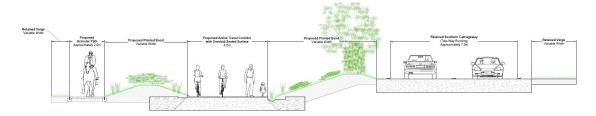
Typical cross section with a lower-level retained southern carriageway
